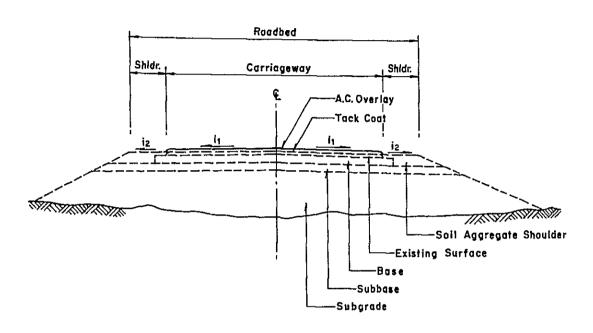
TYPICAL OVERLAY AND RECONSTRUCTION SECTIONS
